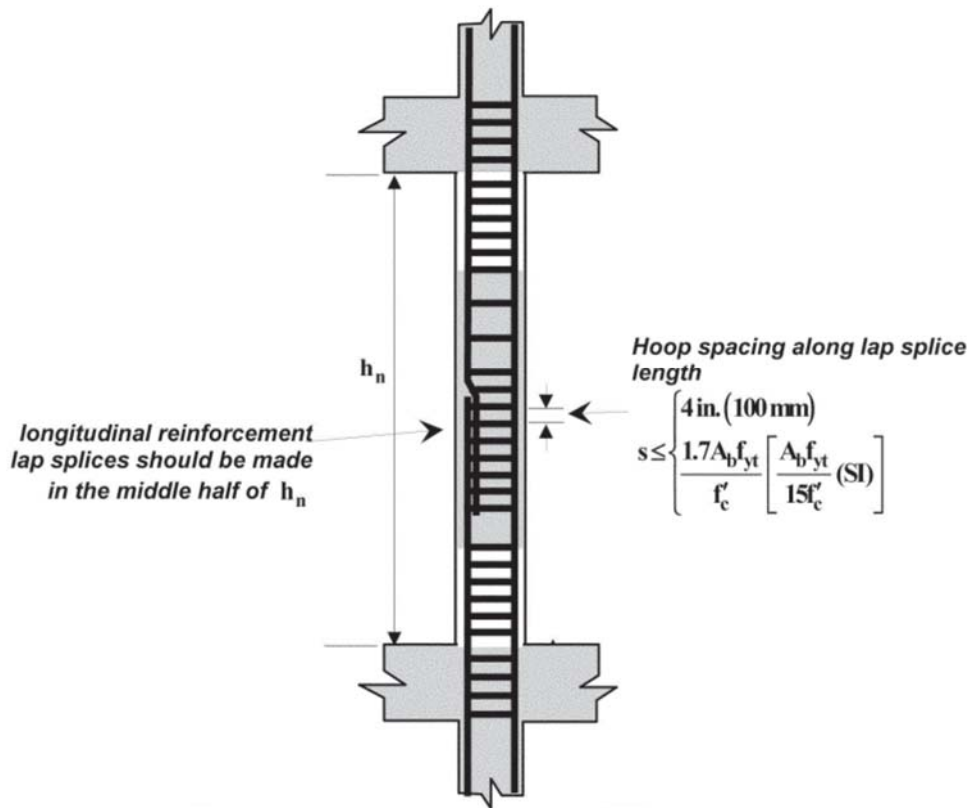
Confinement hoop spacing in columns for splices.
